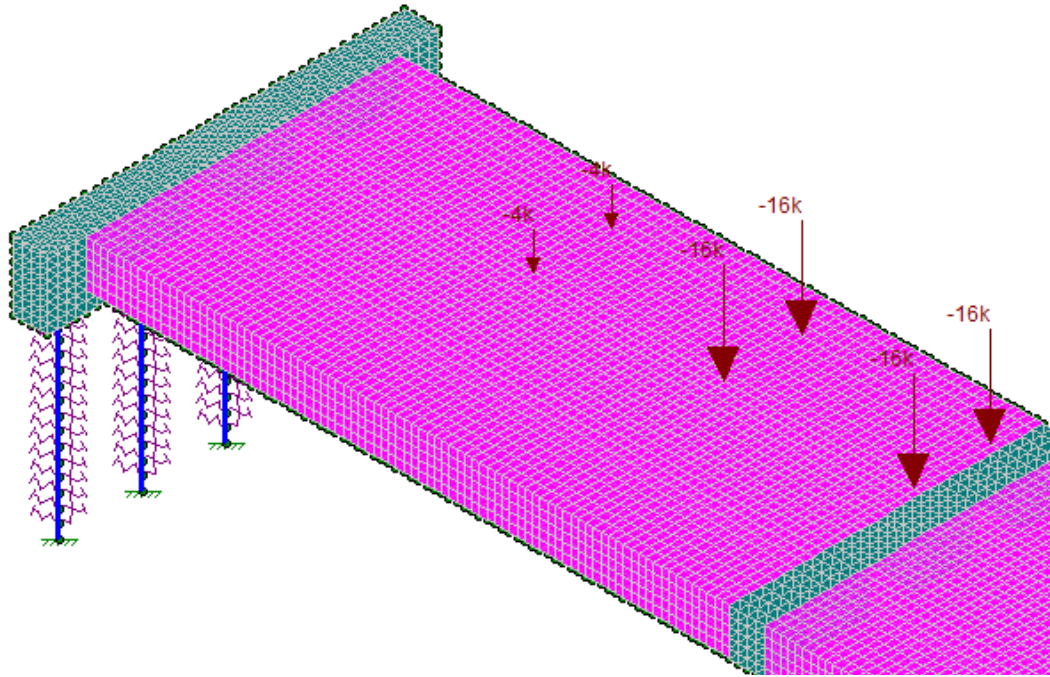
Isometric view of the truck loading on Span 1 in the east to west direction
